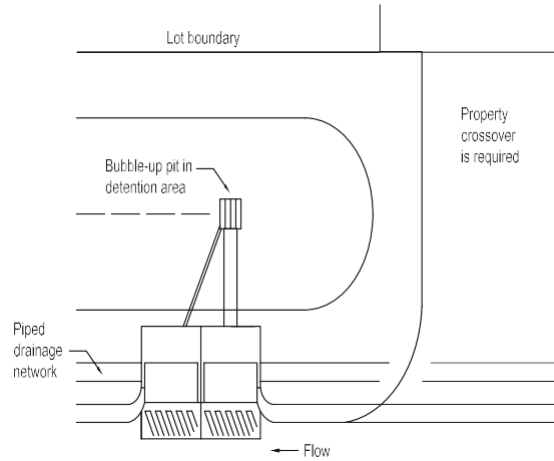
Plan view of the pipe network with bubble-up connection to the piped system. (Source: TME 2003.)
